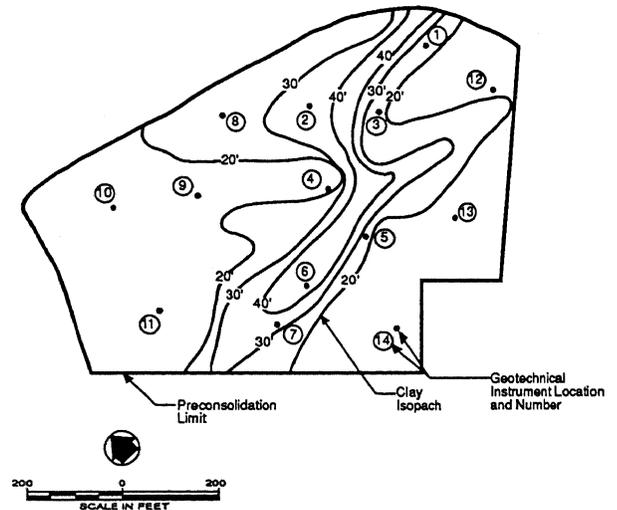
CLAY ISOPACH AND GEOTECHNICAL INSTRUMENT LOCATIONS
